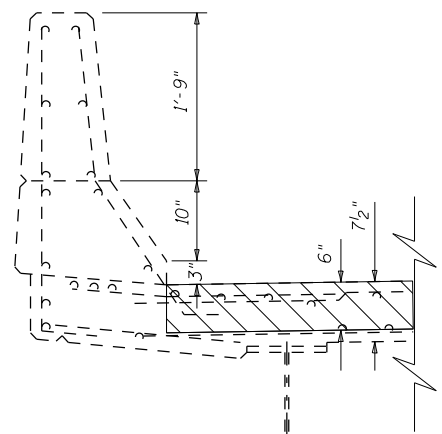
DETAIL OF STRUCTURAL REPAIR OF CONCRETE
